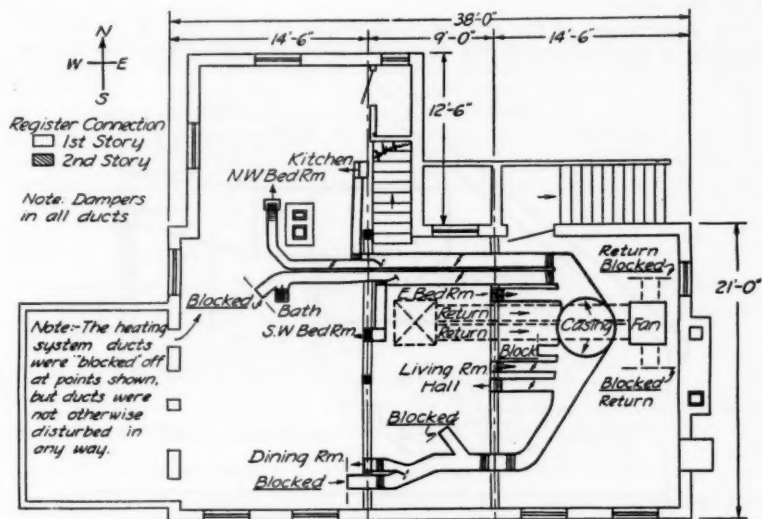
BASEMENT PLAN, SHOWING DUCT LAYOUT FOR FORCED-AIR SYSTEM IN USE FOR DISTRIBUTING COOL AIR
